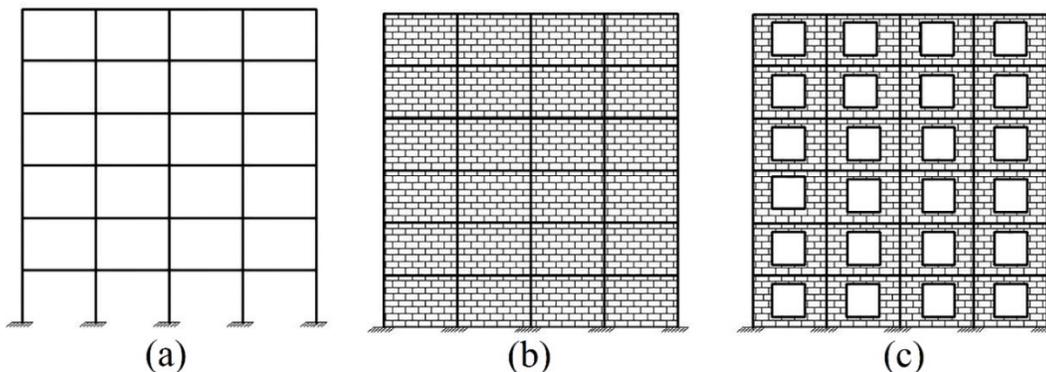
Different situation of infill walls in each frame (a) frame without infill wall (b) frame with infill wall without opening (c) frame with infill wall with 30% opening.
